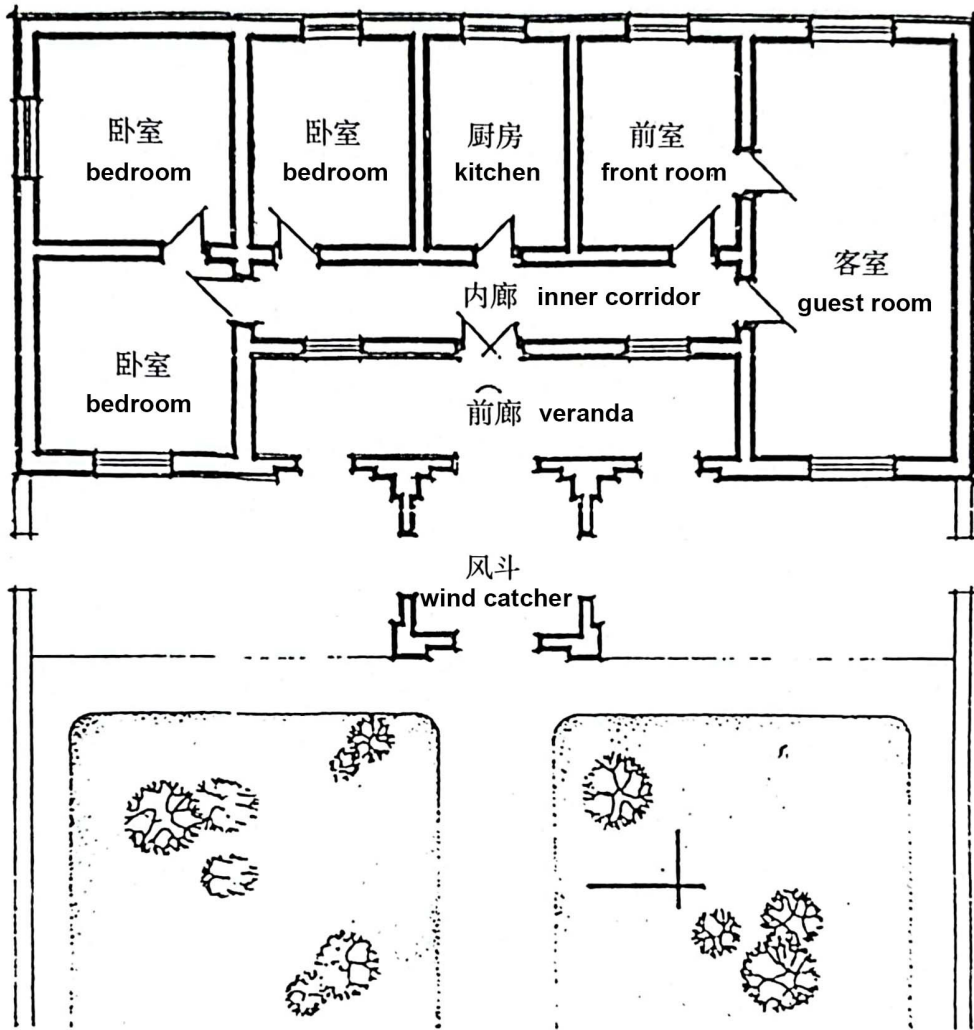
Floor plan of Kyrgyz house and courtyard.⁸³ Translated by author.
